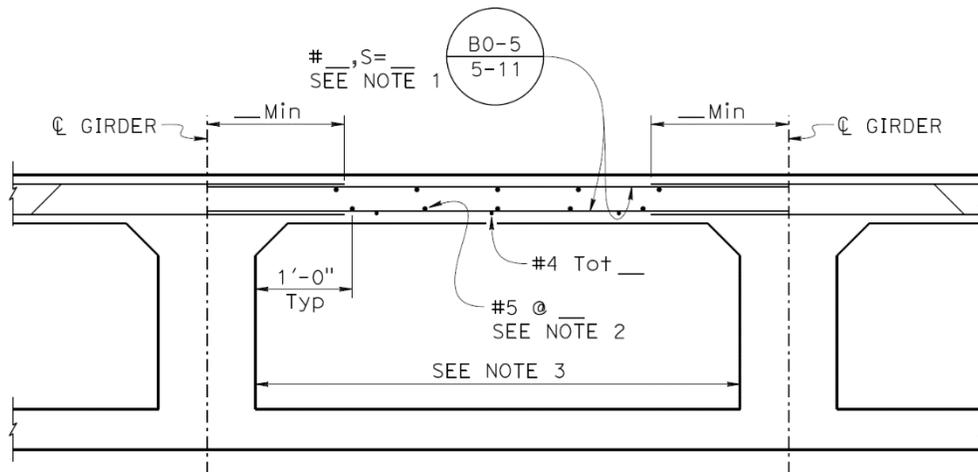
Transverse Reinforcement for Interior Girders
